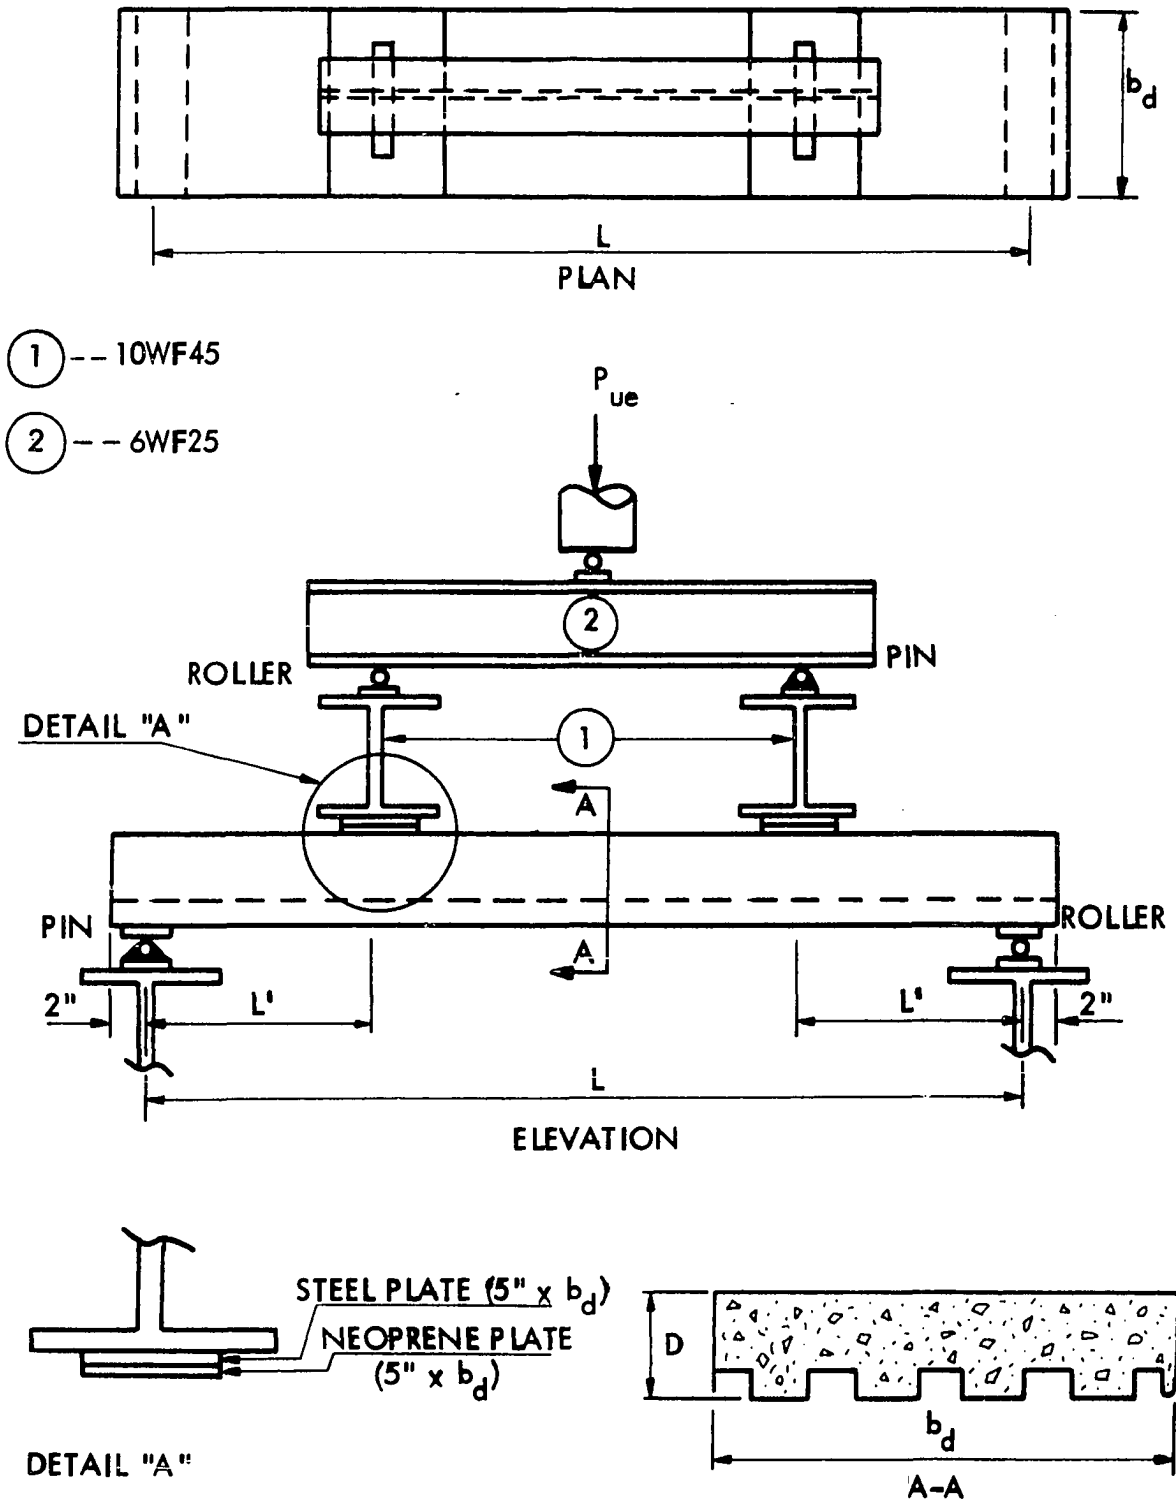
Typical composite steel-deck-reinforced beam test setup
